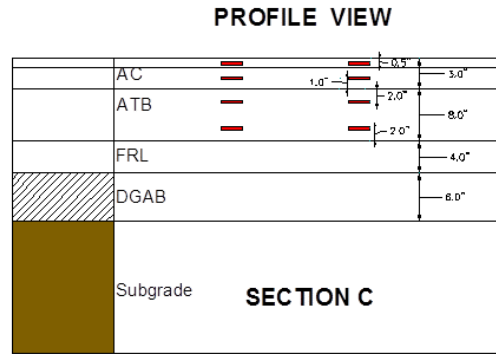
Illustration. Profile view detail of rosettes instrumentation for Section C.
